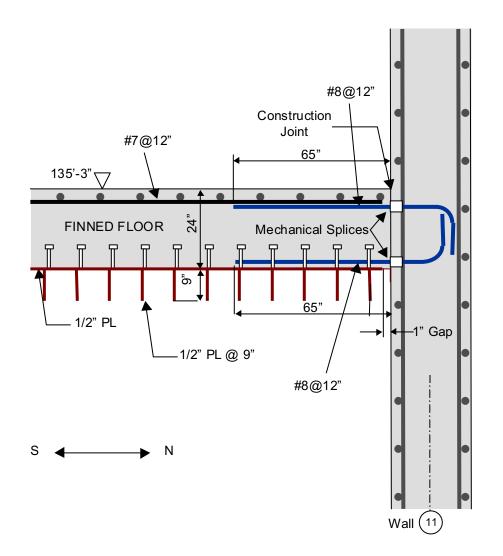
H.5-9 (Sheet 2 of 3) [Auxiliary Building Finned Floor]
